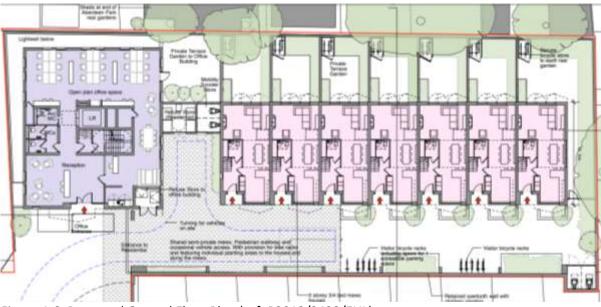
Proposed Ground Floor Plan (ref: P2019/2429/FUL)
